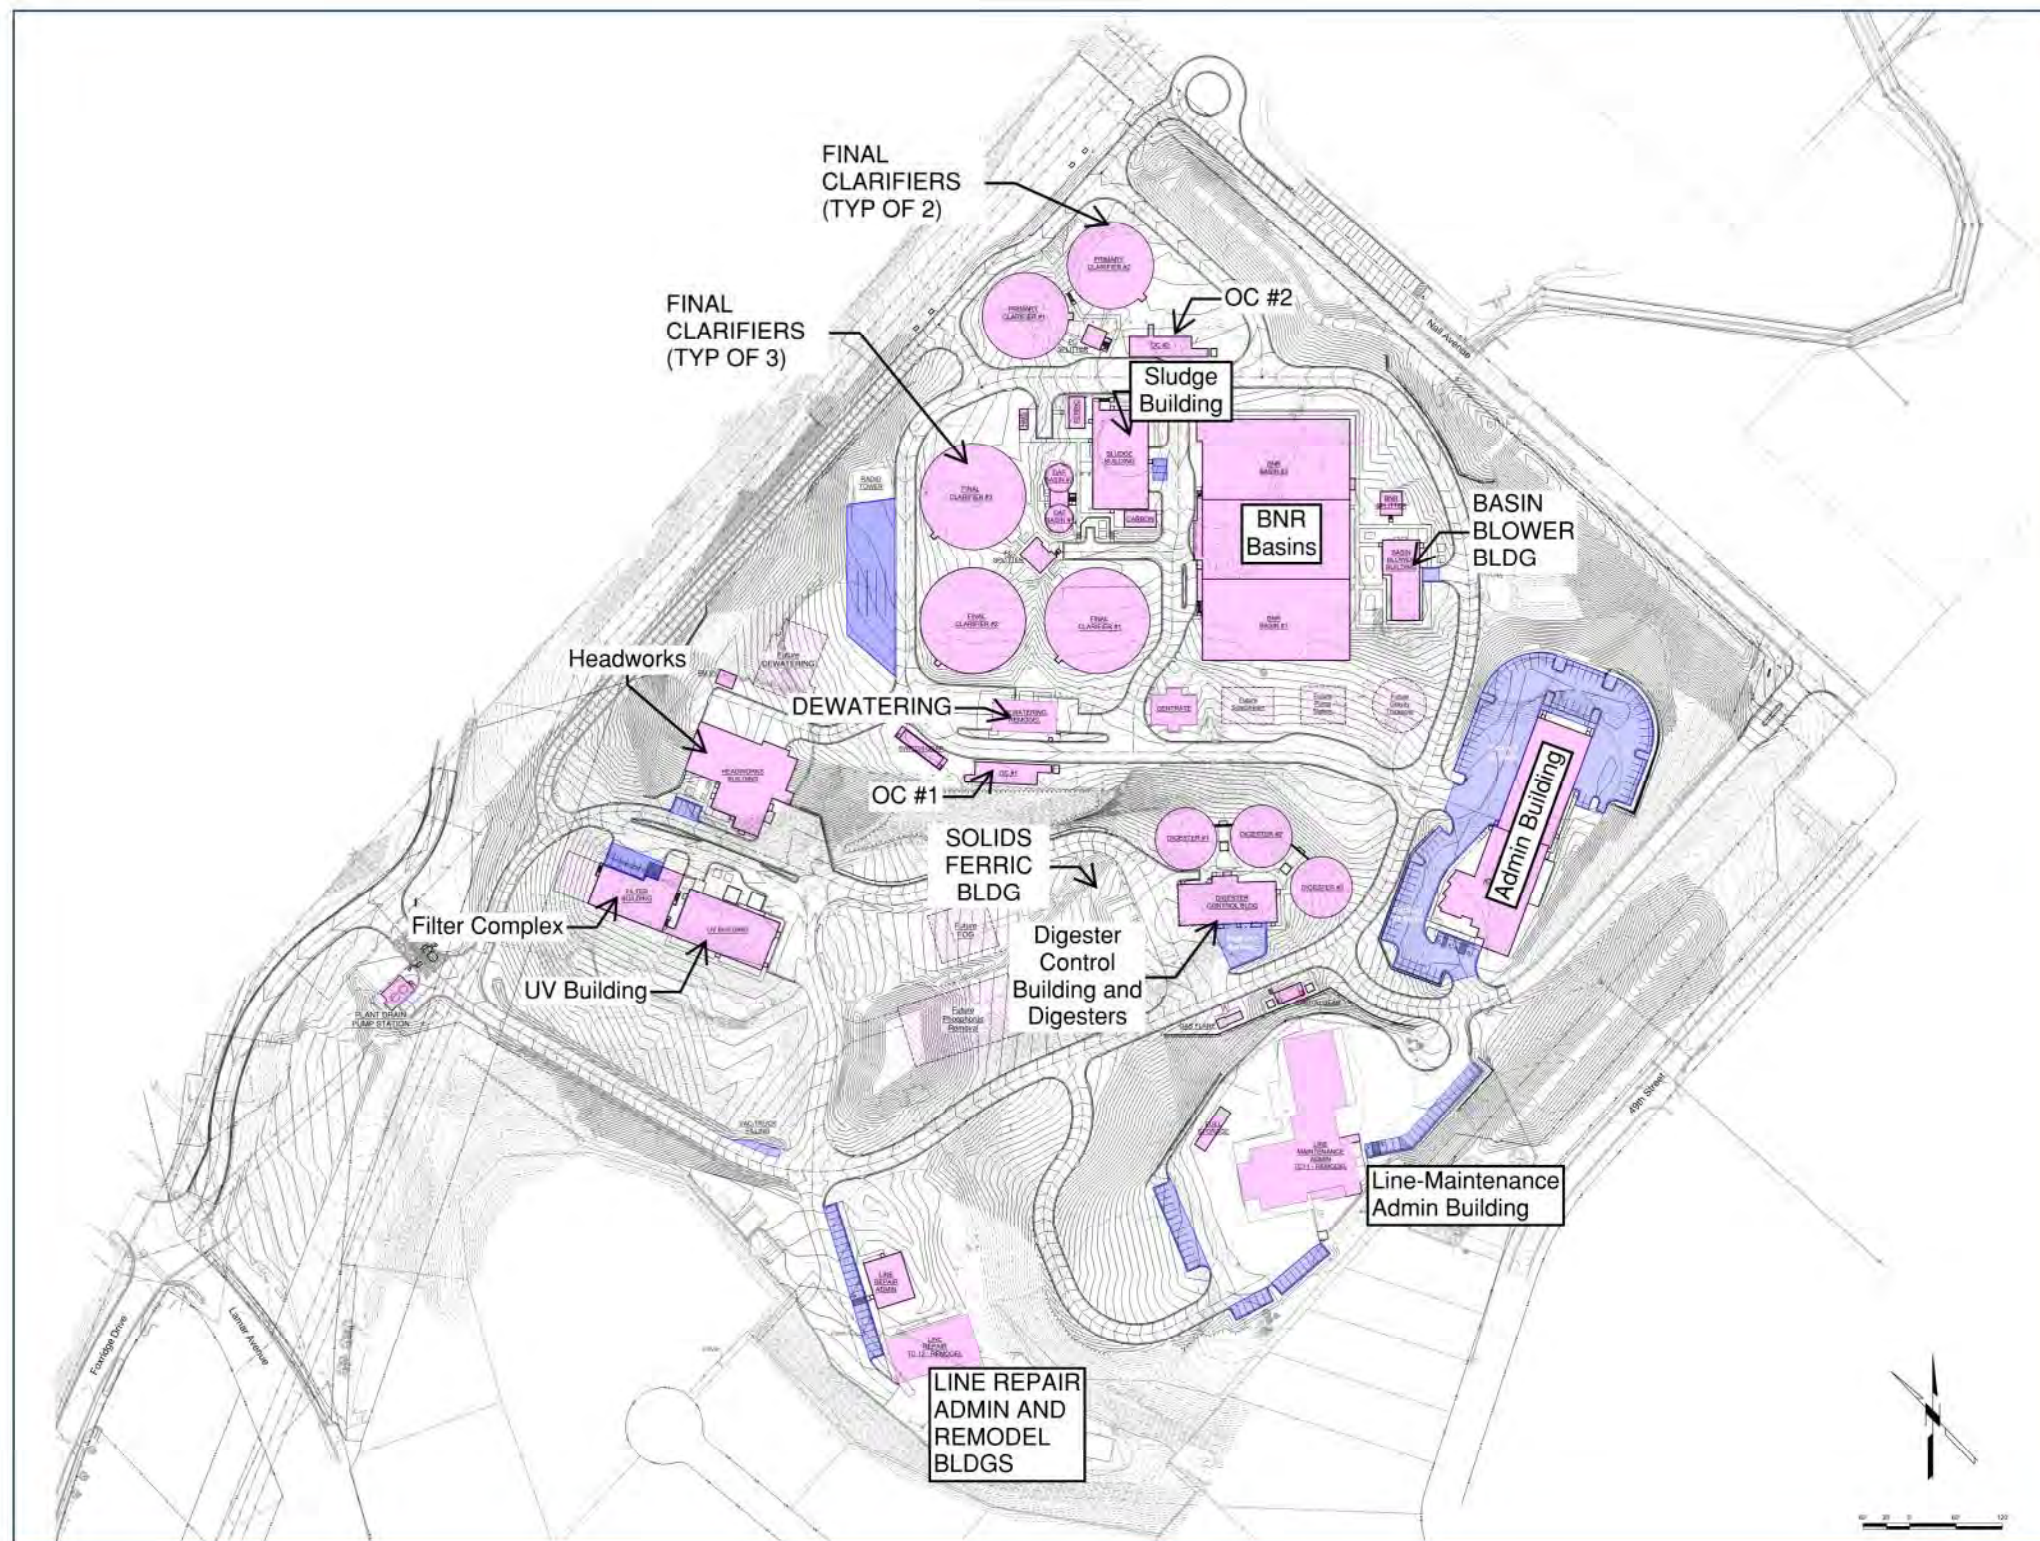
Nelson Wastewater Treatment Facility Showing Improvements Proposed Site Plan.
